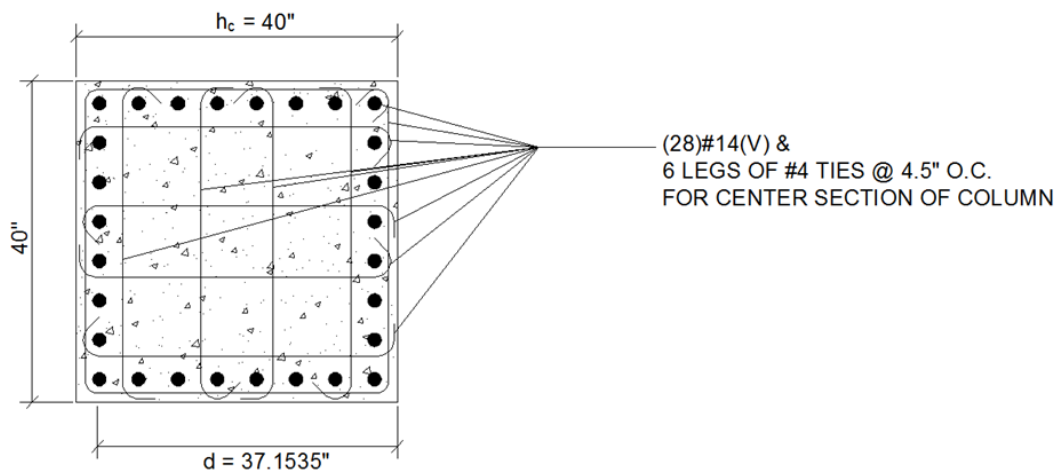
Exterior corner column, cross-section at center section of column at ground floor level at the corners based on tsunami design requirements.
